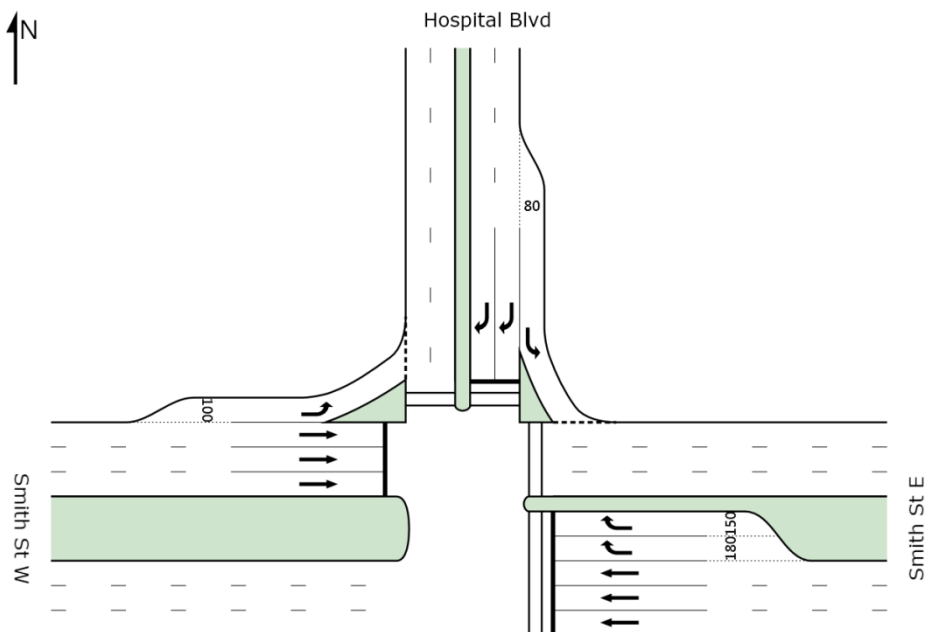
Smith Street / Hospital Boulevard – SIDRA Intersection Layout
